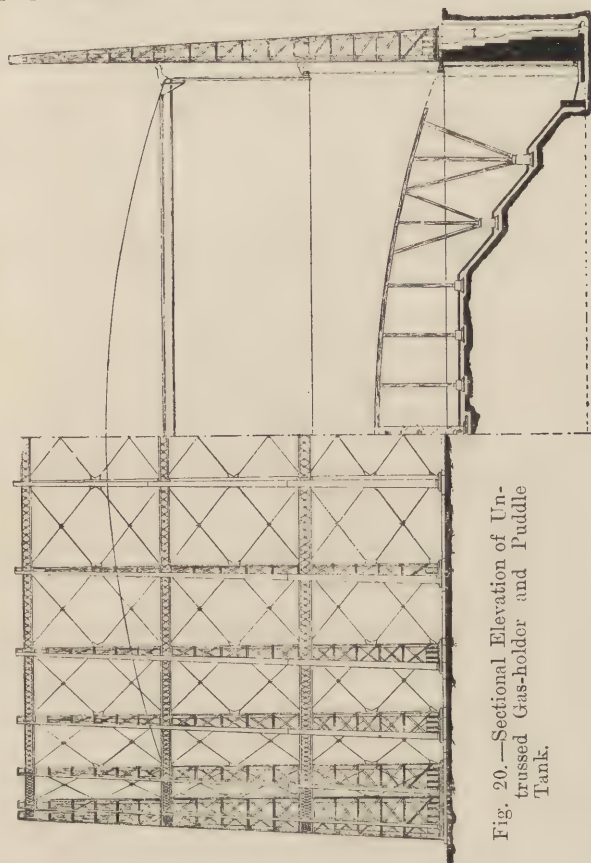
Sectional Elevation of Un-trussed Gas-holder and Puddle Tank.
